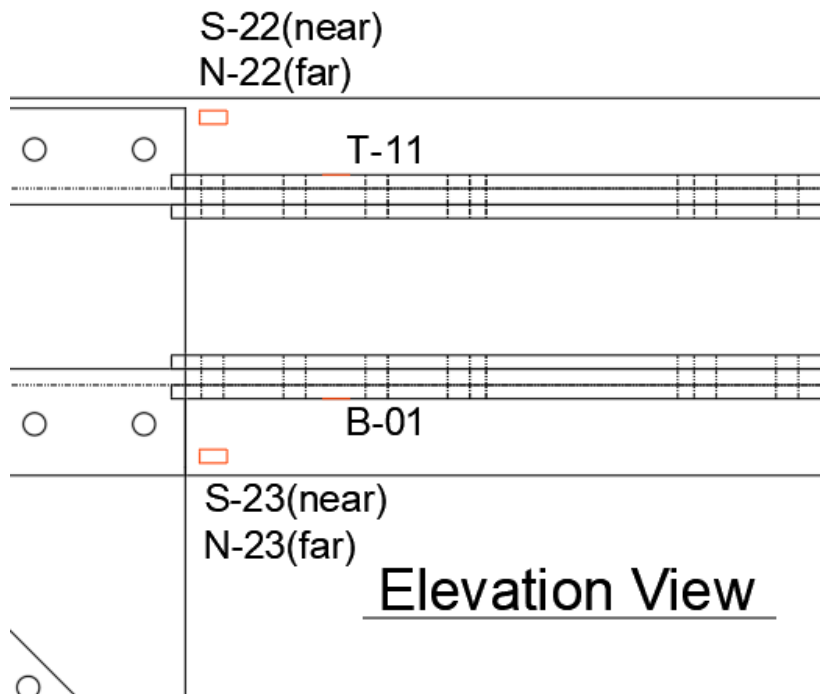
Elevation view of exposed portion of channels showing strain gage labels
